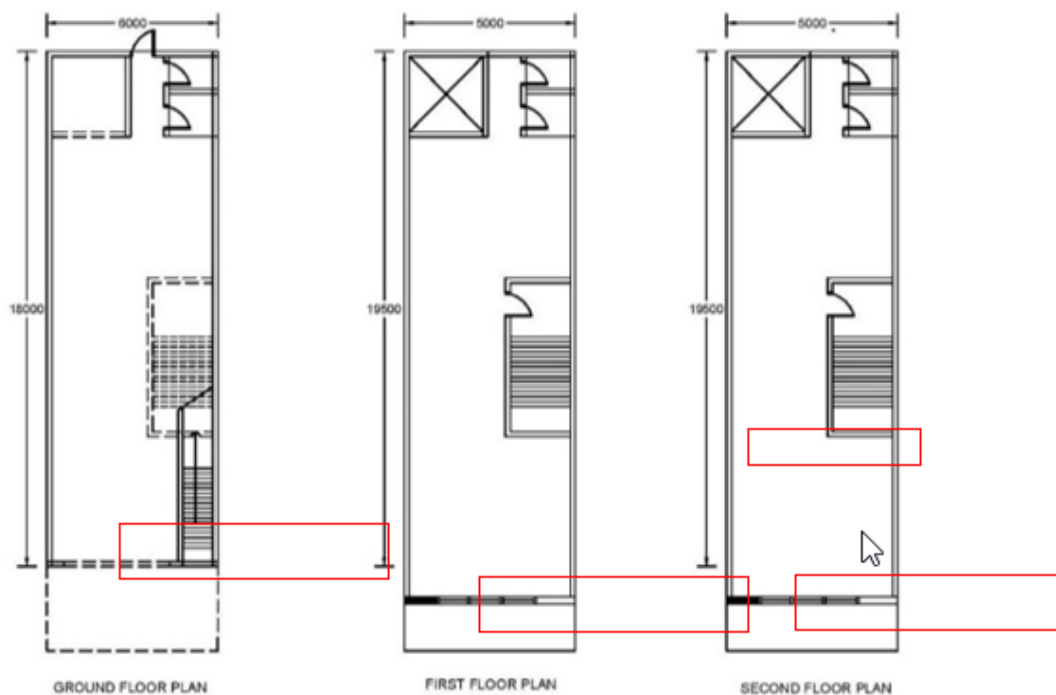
Layout Plan Of 3-Storey Prominence Shop Office, Bukit Mertajam.
